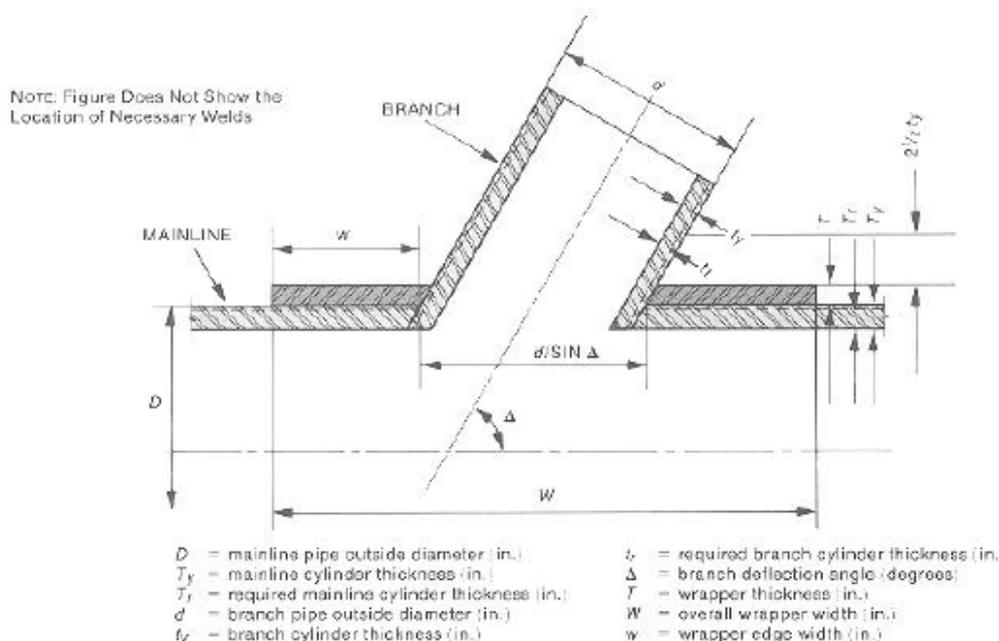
Reinforcement of Openings in Welded Steel Pipe
